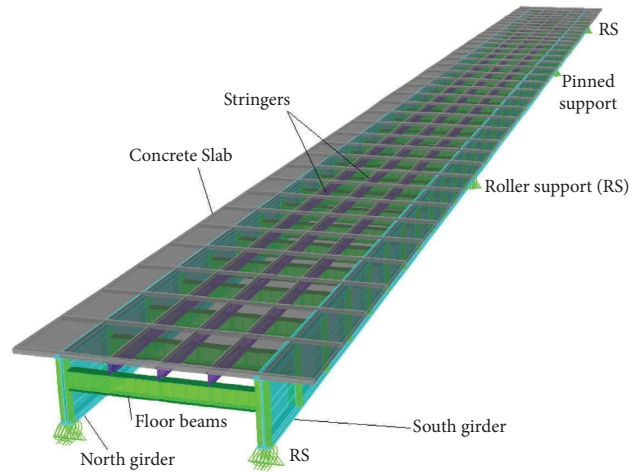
3D view of the I-40 slab-on-girder bridge FE model.
